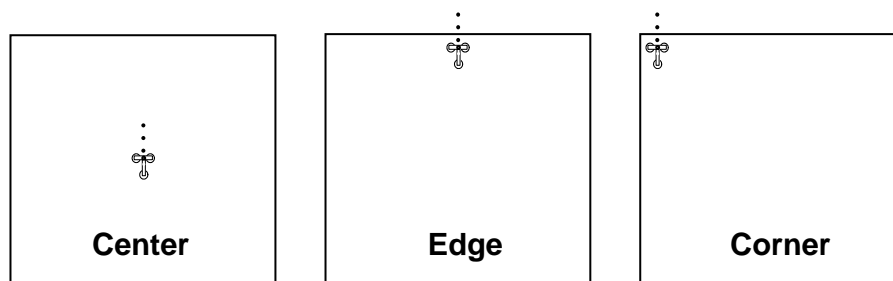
Testing Point Orientation with Load Frame Location and Accelerometer Arrangement on Test Slab
